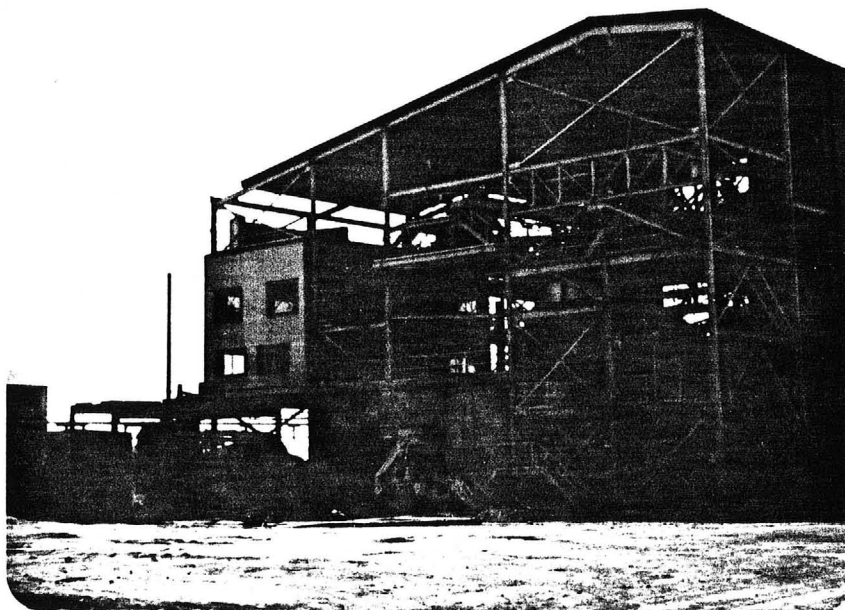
Photo taken prior to partially dismantling the plant. Shows overall view of Noranda DRI Plant Complex. Reduction Rotary Kiln, Rotary Dryer and Afterburner Tower are at the center. The Induration Plant building is in the background on the right.
